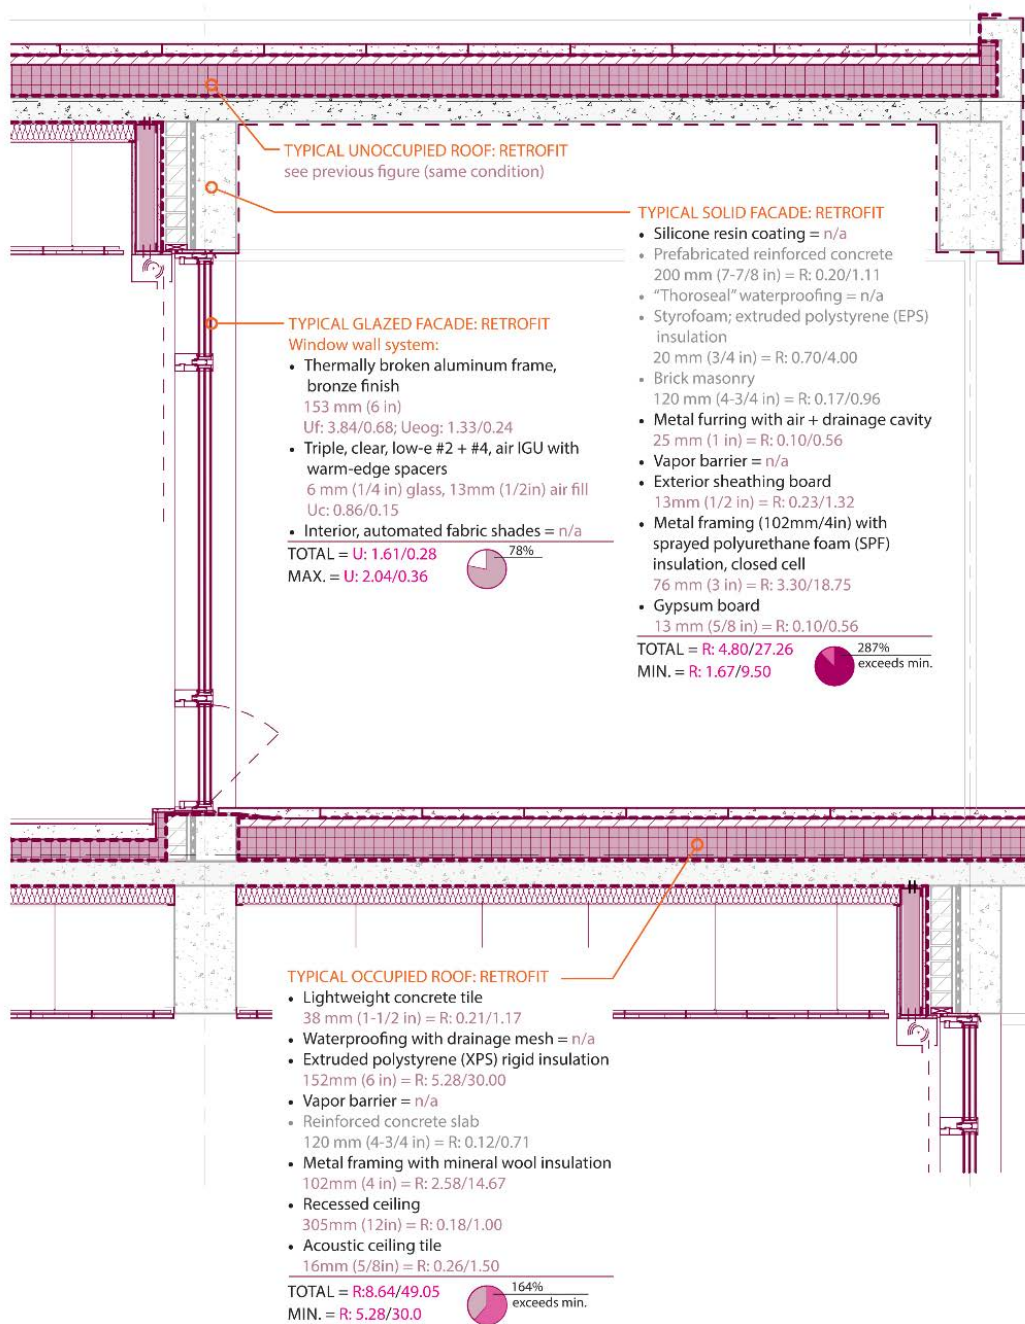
Detailed illustration and thermal performance summary of the proposed retrofit building enclosure at the Sava Center's *Building A* typical office suite condition (personal archive).
